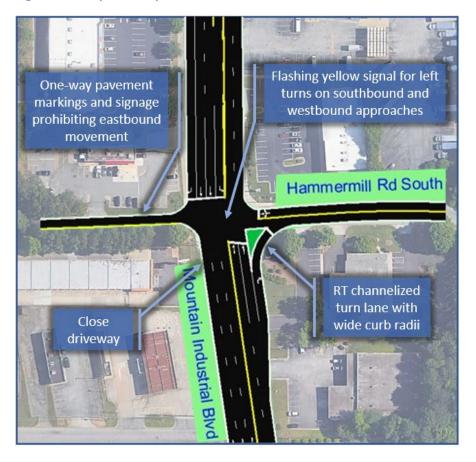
Proposed Improvements at Mountain Industrial Boulevard and Hammermill Road (South)
